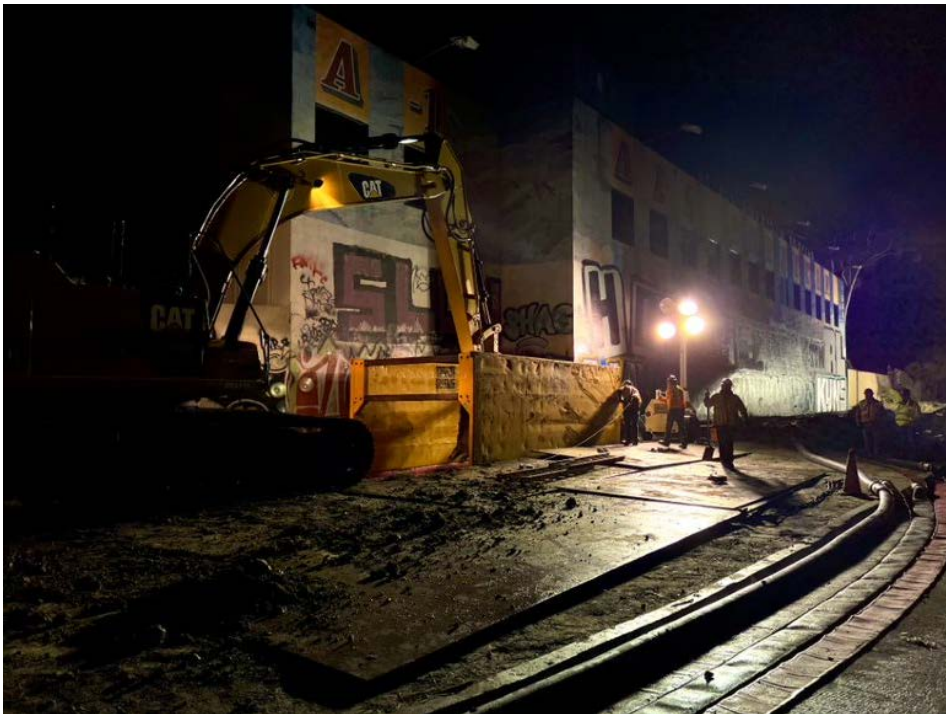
Installation of shoring at the sinkhole site on December 31, 2021 at 2:45 a.m. View facing southeast from the I-110 Freeway northbound off-ramp to 220th Street.
